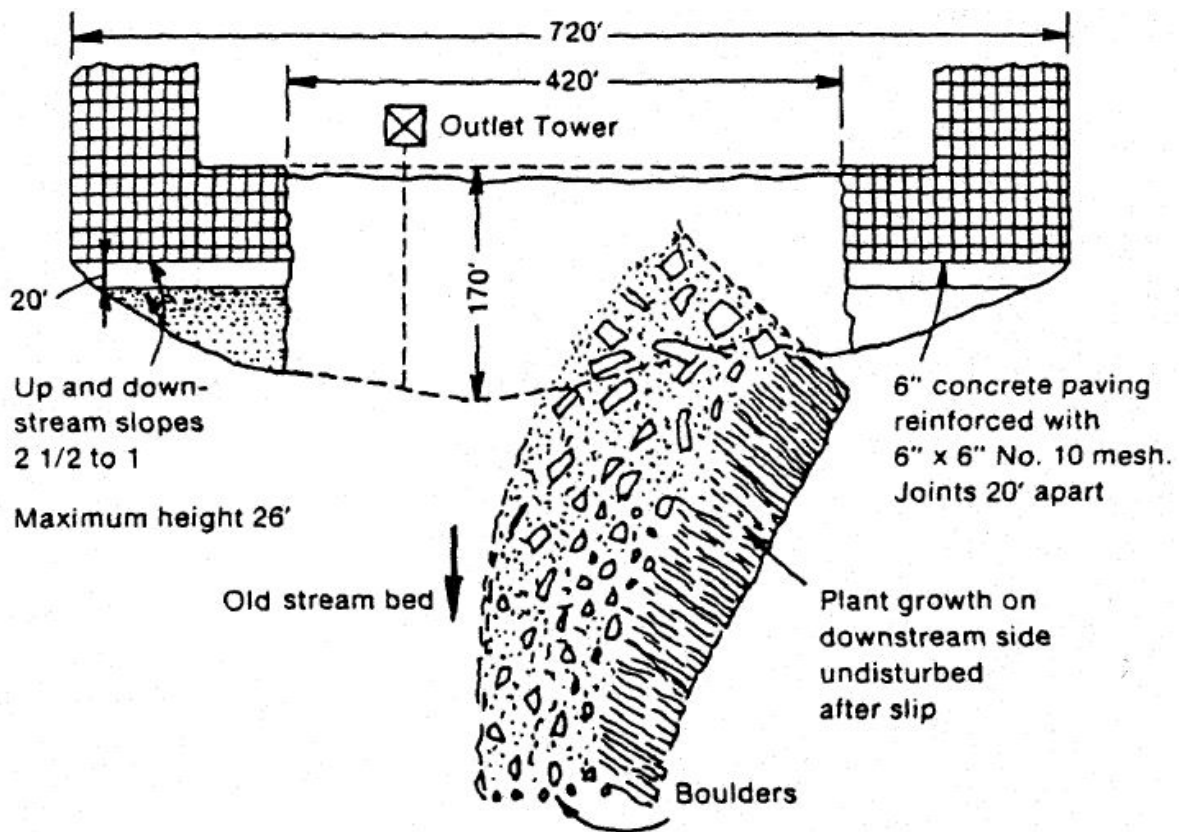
Plan view showing post-failure conditions (Engineering News Record, 1925).
